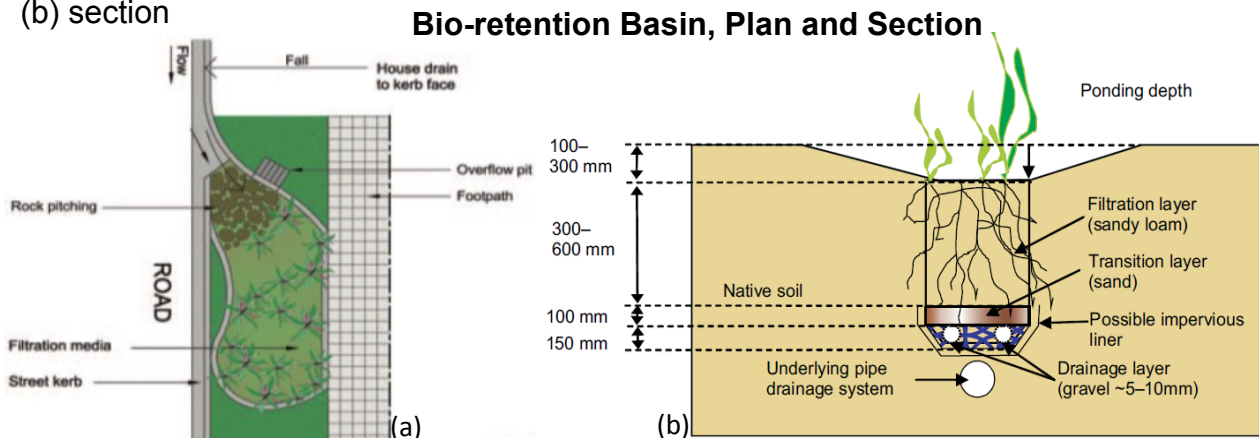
Bio-retention Basin Typical Plan and Section (Source; Allison & Francey, 2005)
